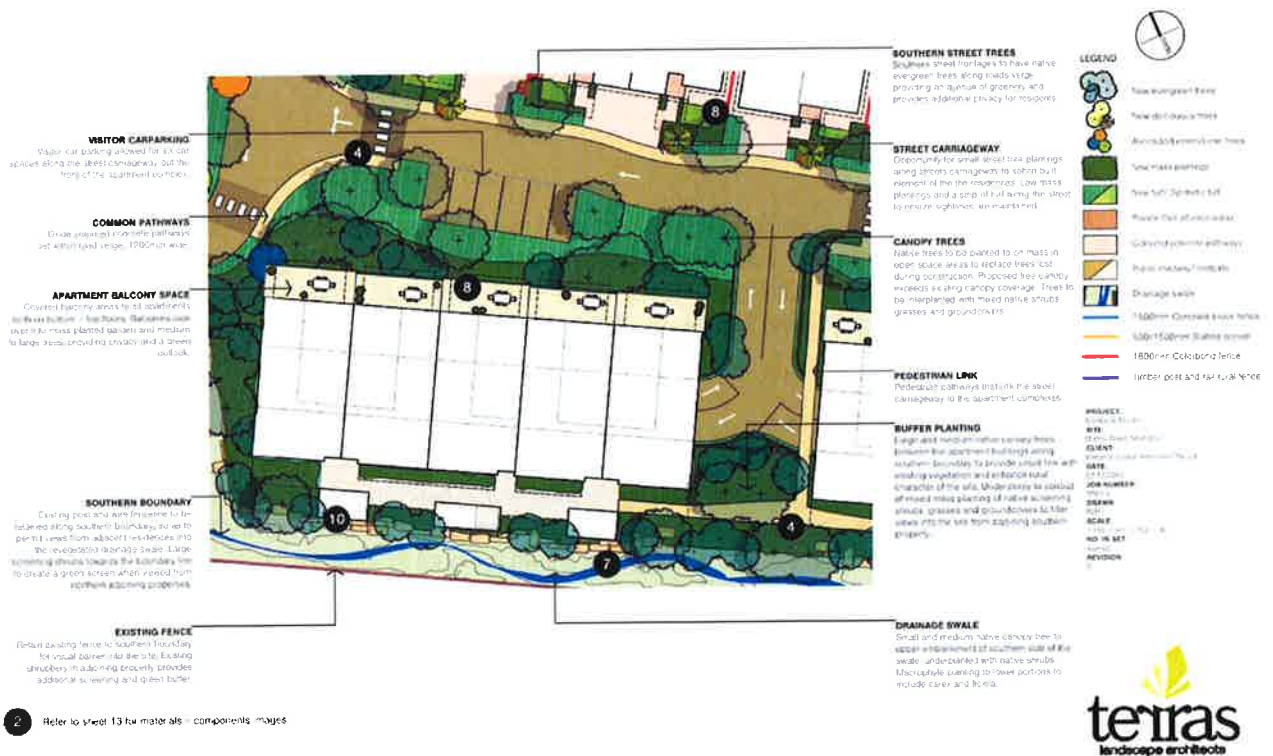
Typical Apartment Block Landscape Plan (source: Terras Landscape Architects)
